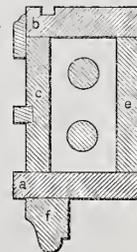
Cross Section of Full Box Frame for Use in a Frame House.
